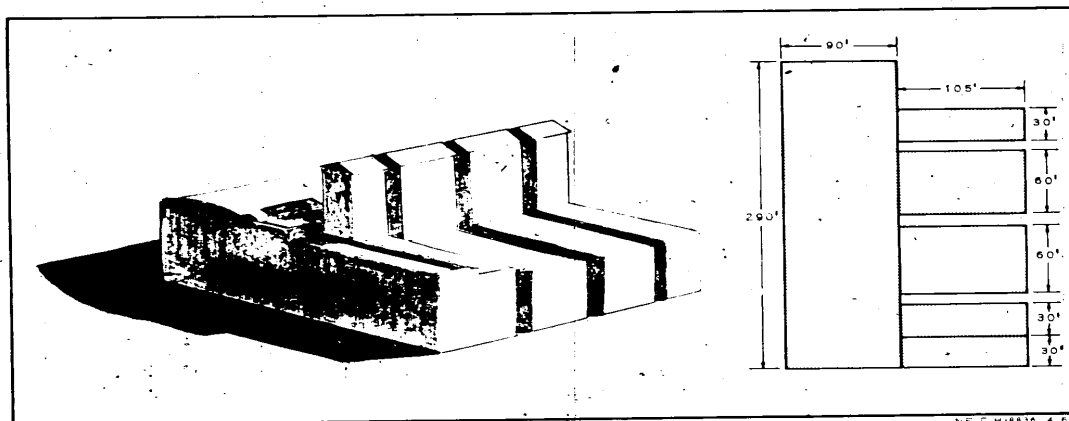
PLAN AND PERSPECTIVE VIEWS OF ENGINE TEST BUILDING, WU-KUNG AIRCRAFT ENGINE PLANT.
